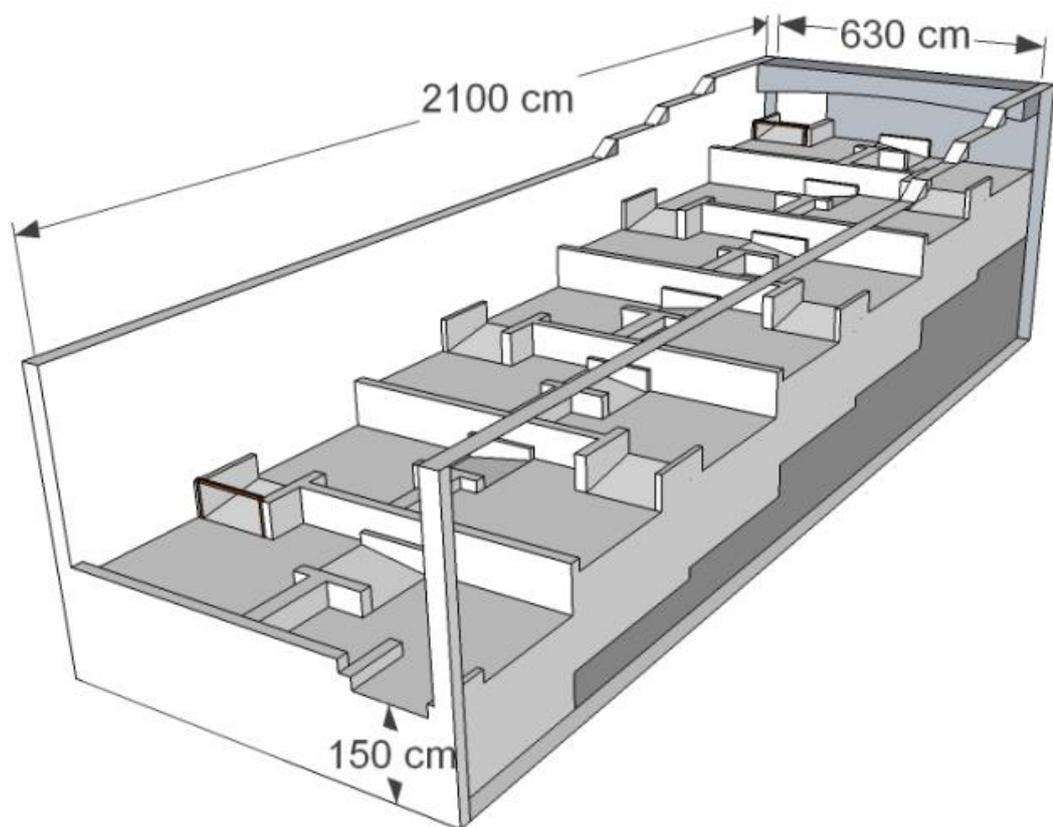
Elvington pool and weir fishway design, consisting of 90° alternating ramp orientation. Note the location of PIT antennae at ramp 2 and the exit ramp.
